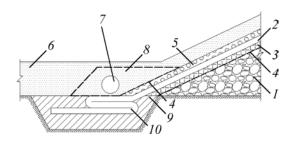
Node At the junction of waterproof material to spoil heap slope: 1 – spoil heap body; 2 – waterproof layer; 3 – gas drainage layer; 4 – separating geotextile material; 5 – water drainage layer; 6 – protection ground layer; 7 – exhaust pipe; 8 – exhaust toe; 9 – plastic ground in a groove; 10 – compensating fold
